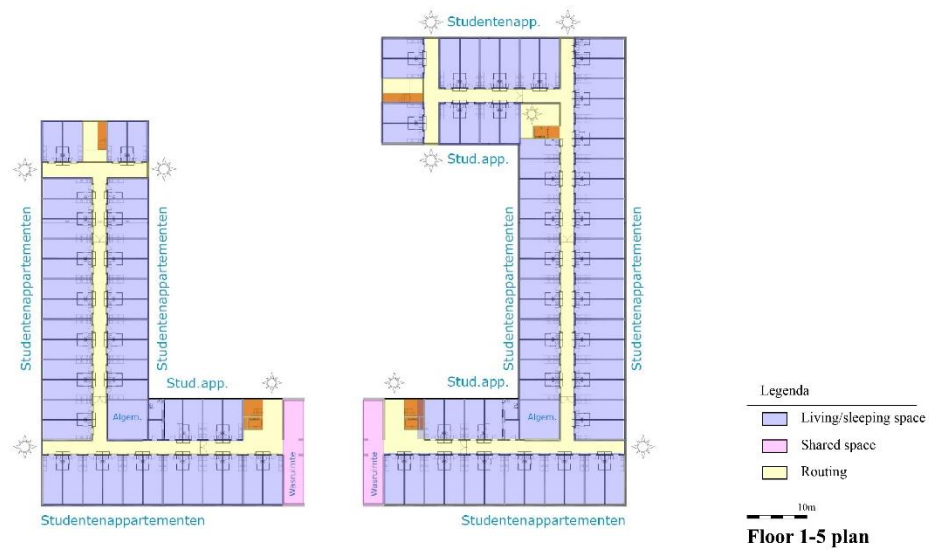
Röntgenweg case study analysis project building scale floor plans (Studentenhuisvesting Spoorzone | Leeuwenkamp Architecten, n.d.)
